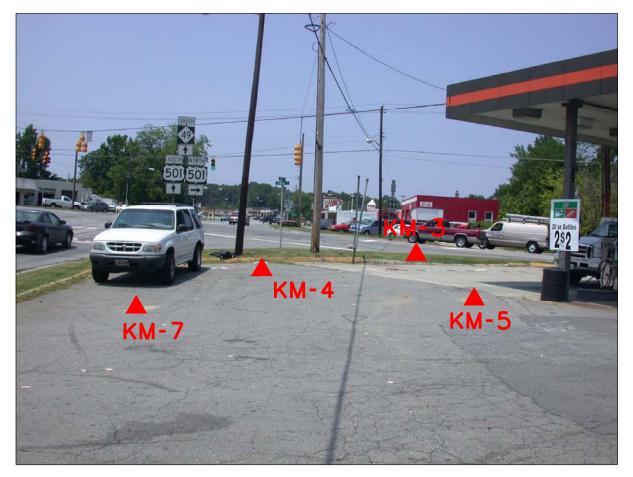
BORINGS AT KIM PROPERTY LOOKING WEST FROM BUILDING
